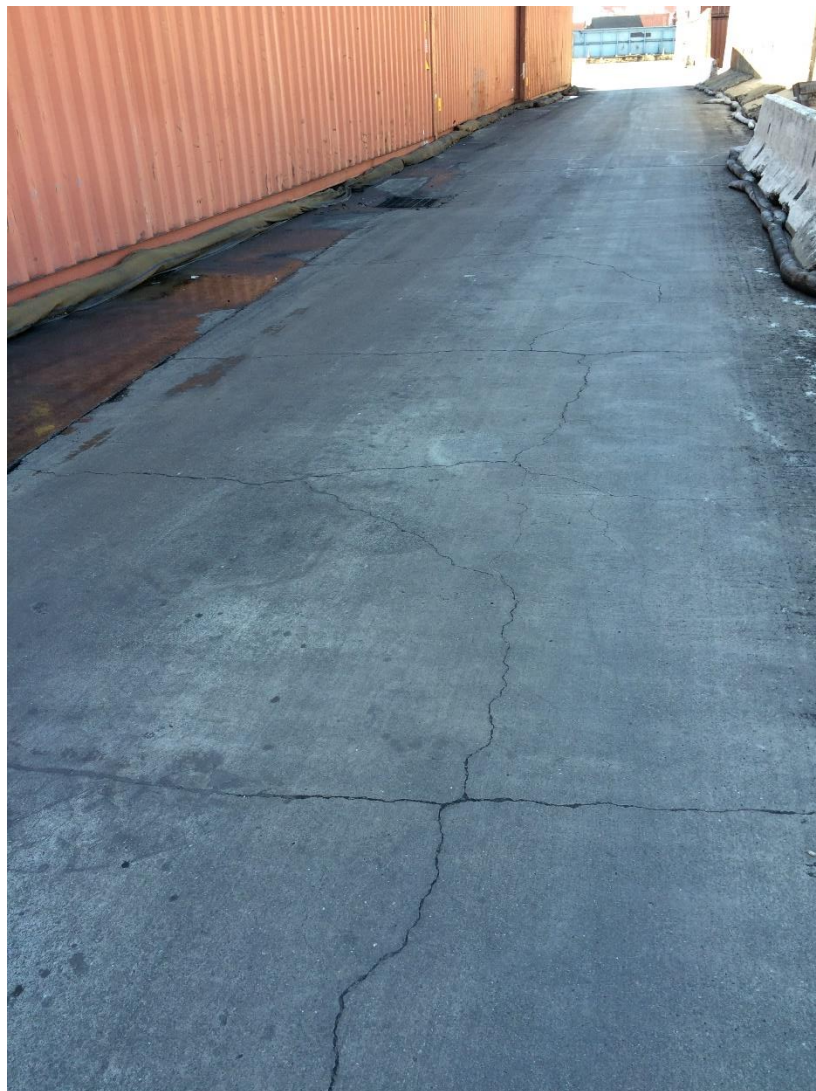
Looking south toward drain inlet 3DI-11A: areas of surficial cracking.
